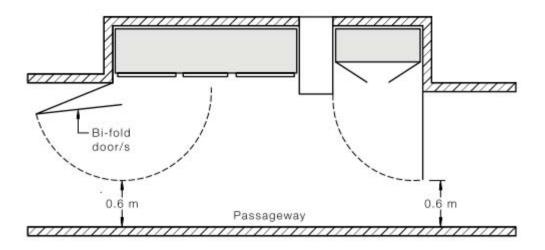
ACCESS TO SWITCHBOARDS— SWITCHBOARDS WITH DOORS THAT OPEN INTO ACCESSWAYS OR NARROW PASSAGEWAYS
